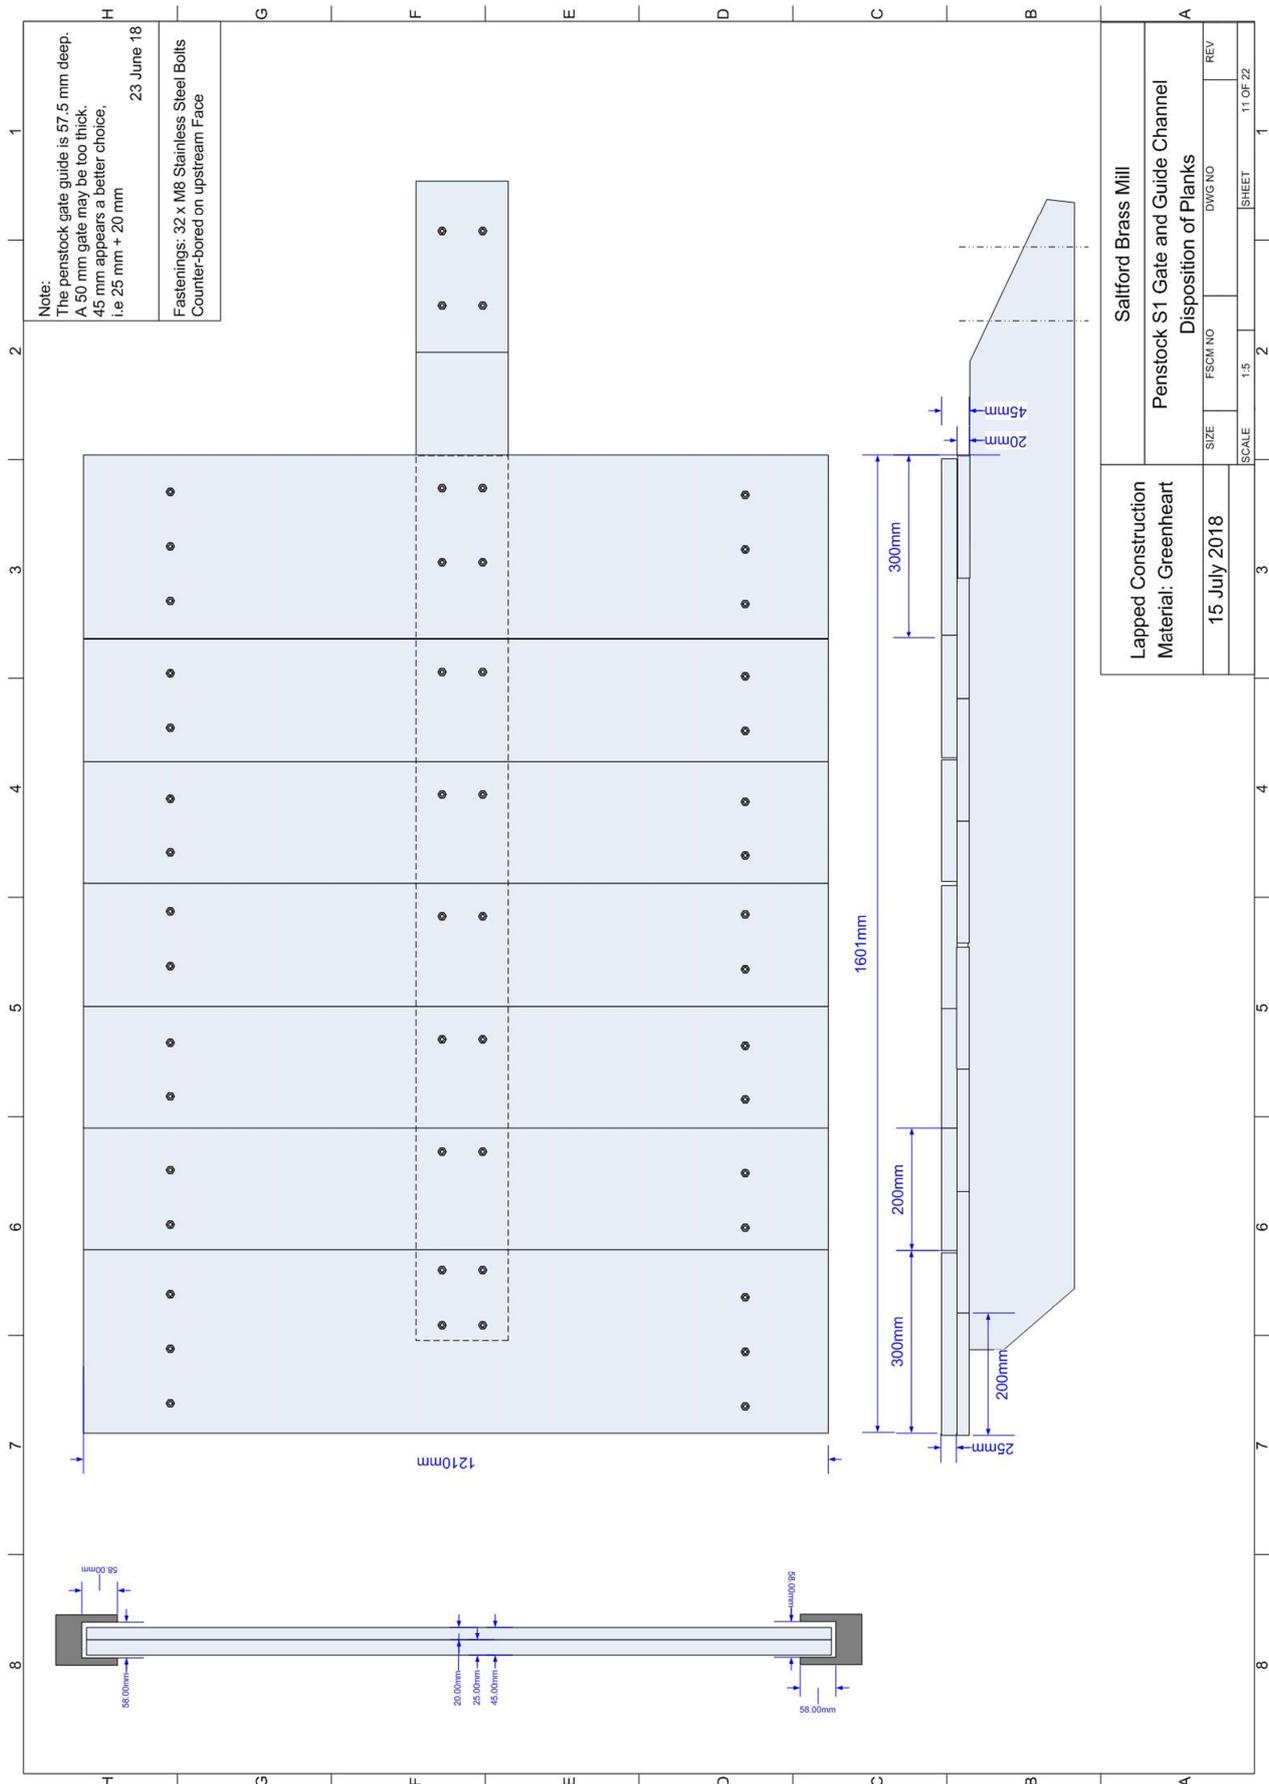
Penstock Gate W1 - Gate – Lapped Construction
